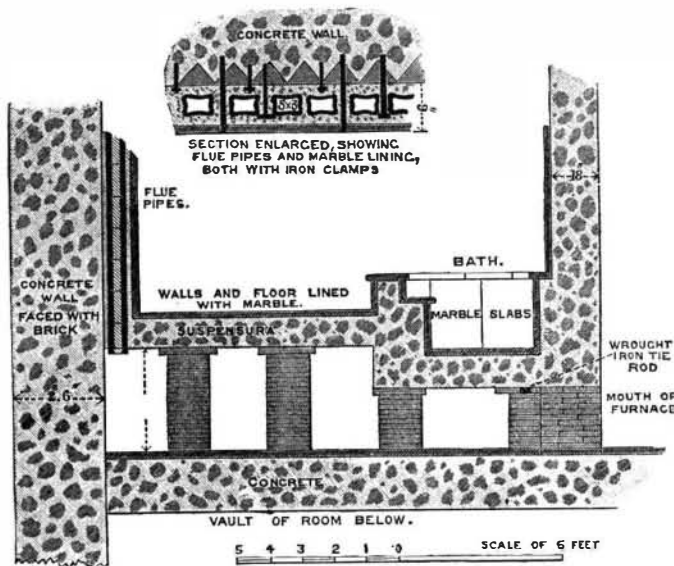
SECTION OF A PRIVATE BATHROOM IN THE ATRIUM VESTAE.
